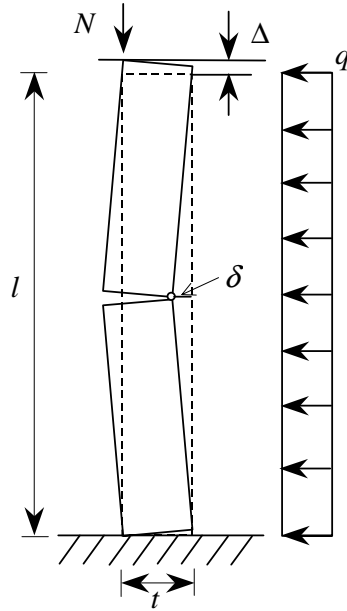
Failure mechanism of masonry with small axial load
